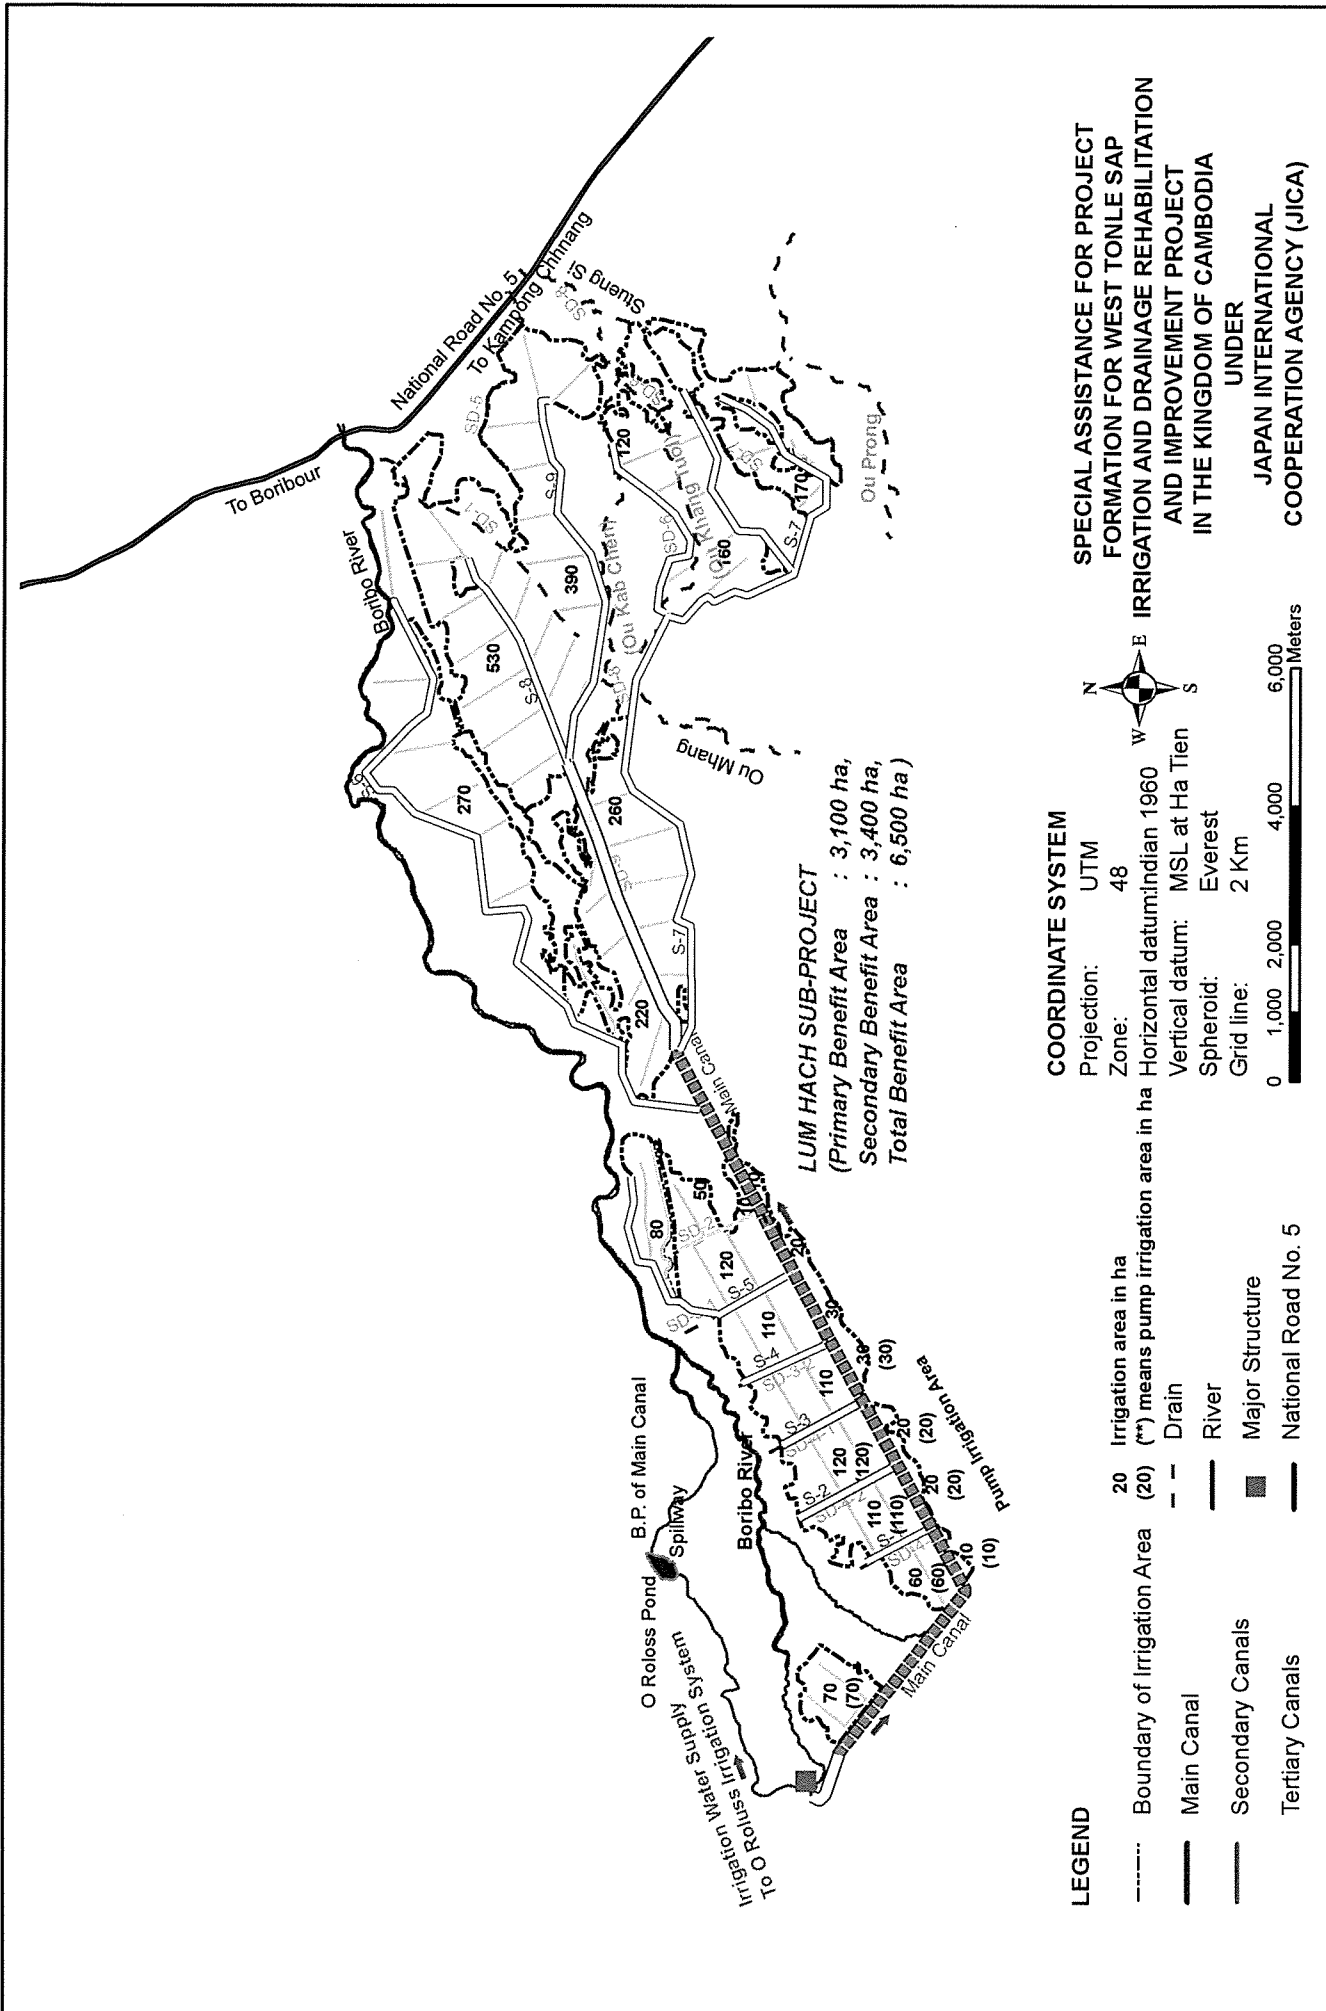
Sections of New Construction and Rehabilitation of Main and Secondary Canals in Lum Hach Sub-project
